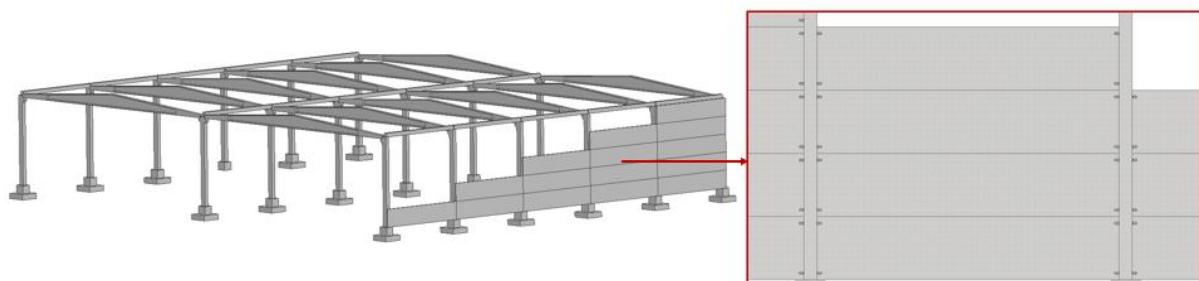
Three-dimensional overview of an industrial PRC building with façade panels and associated connections.
